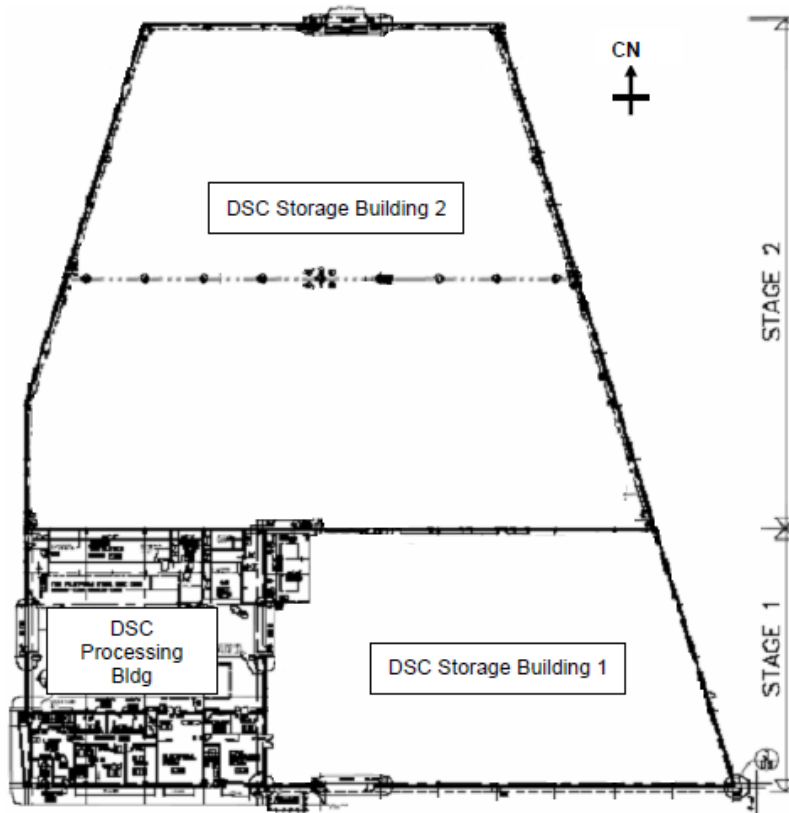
Layout of the Used Fuel Dry Storage (Phase I)
